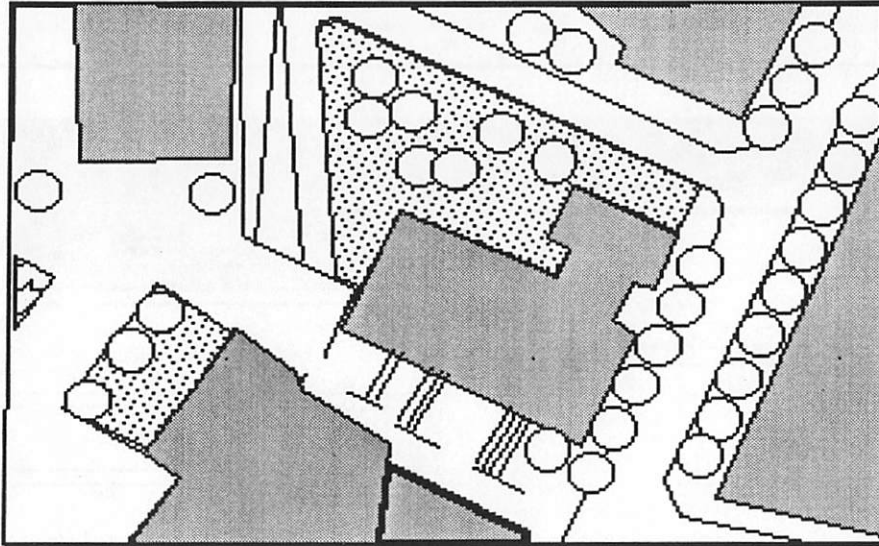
Plan for walkway from Avenue de Diego to the plaza.
